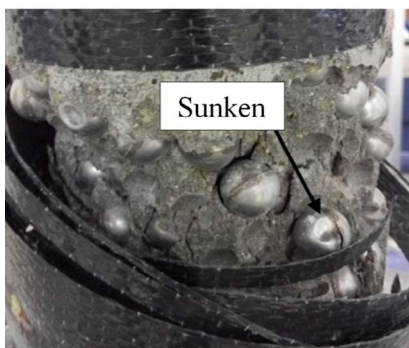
Failure modes of the ceramsite concrete columns.
